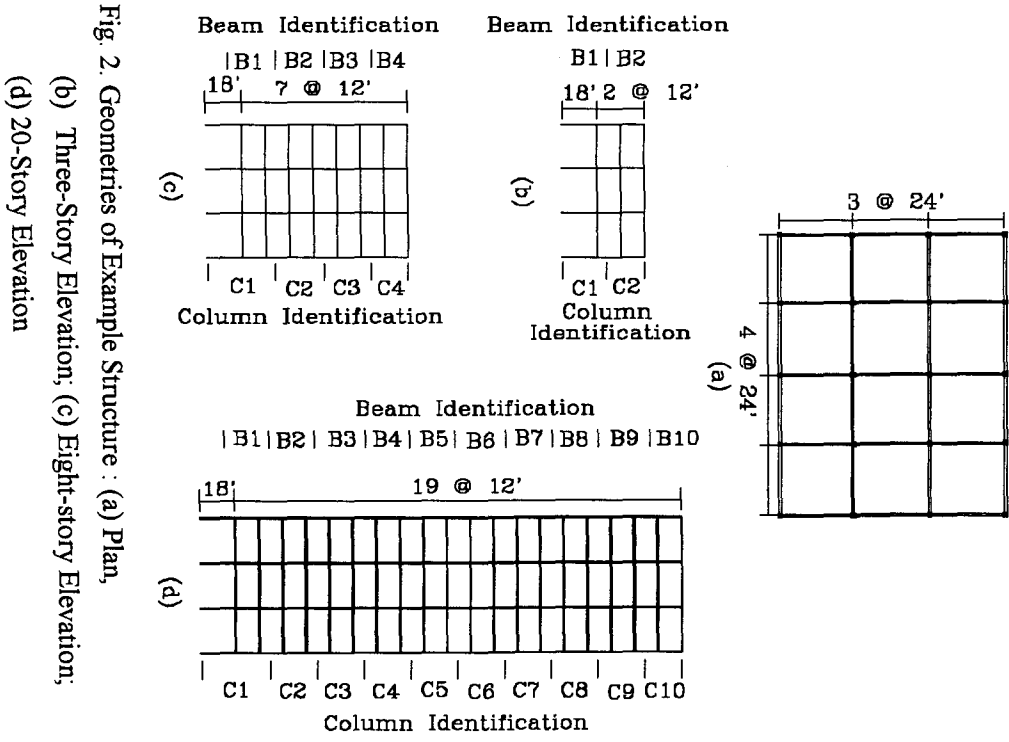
Geometries of Example Structure : (a) Plan, (b) Three-story Elevation, (c) Eight-story Elevation, (d) 20-Story Elevation
